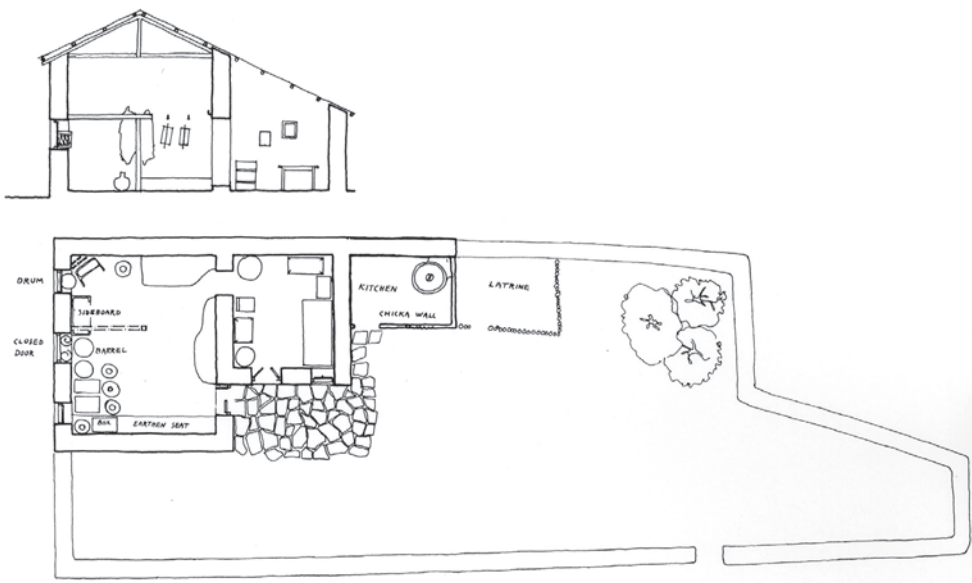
Section and plan of House Kiros Girmay, 1967
